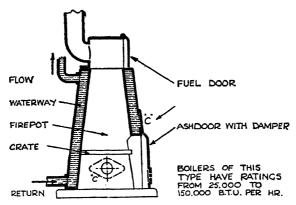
Typical Cast-Iron Domestic Boiler.
